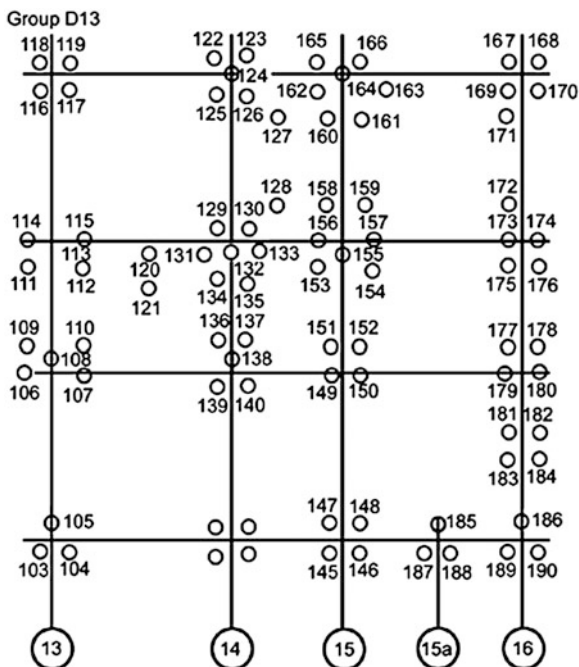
shows the plan of the foundation piles, which consisted of 0.5 m diameter driven cast-in situ piles, extending to a depth of about 20 m, and founded in the cemented hard layers of silt, sand and silty sand. A total of 90 piles were used for the office building.
